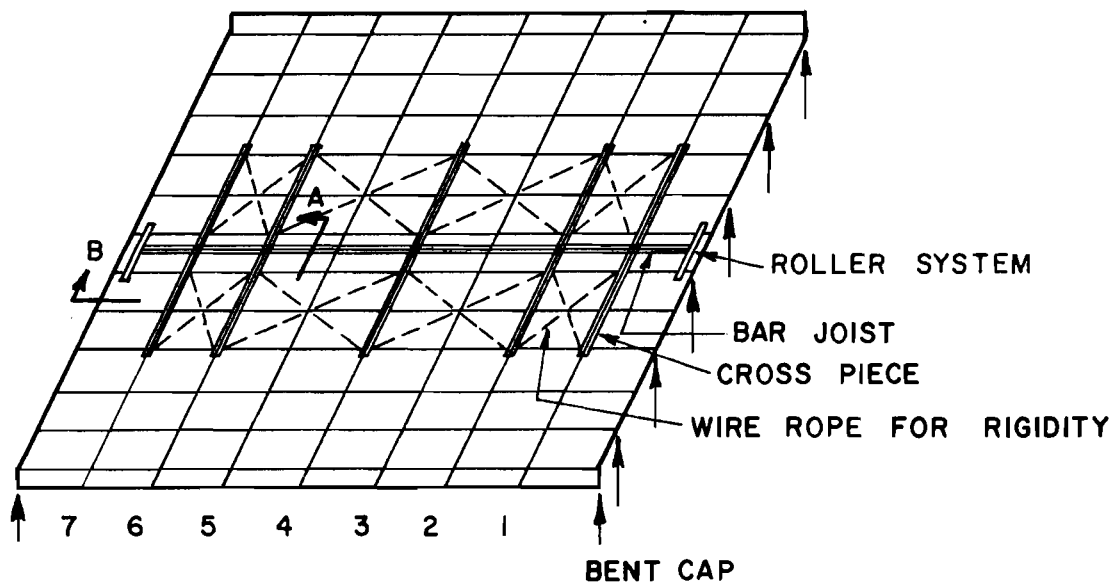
DEFLECTION BRIDGE LAYOUT
